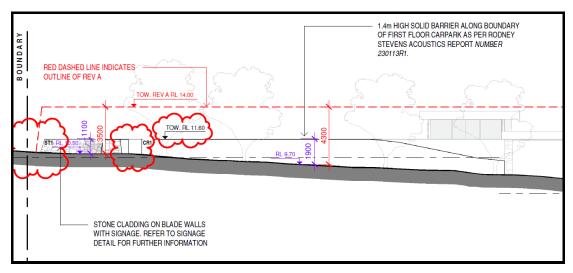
Amended Wellington Street elevation (Source: Innovate, Revision F)
